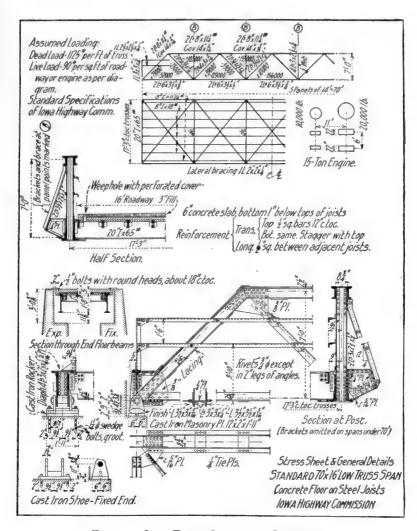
LOW TRUSS SPAN WITH STRINGERS.
